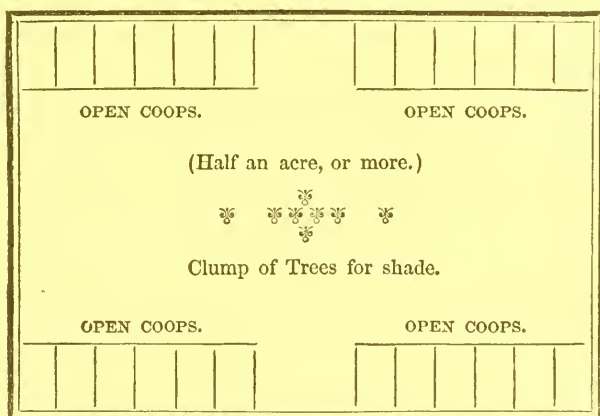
GROUND PLAN OF OPEN SUMMER CHICKEN COOPS.
